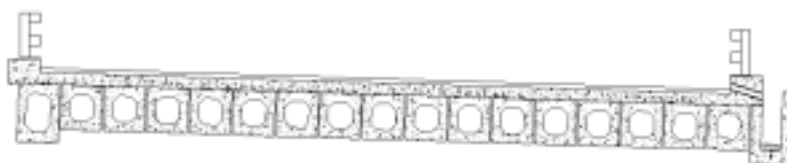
Deck Unit Bridge Deck with Transverse Stressing
